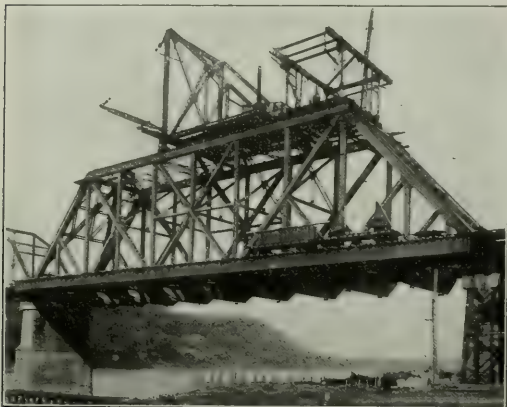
New Span 1 After Removal of Old Trusses Showing Heavy Traveler Erected for Placing Spans 2 and 3.
